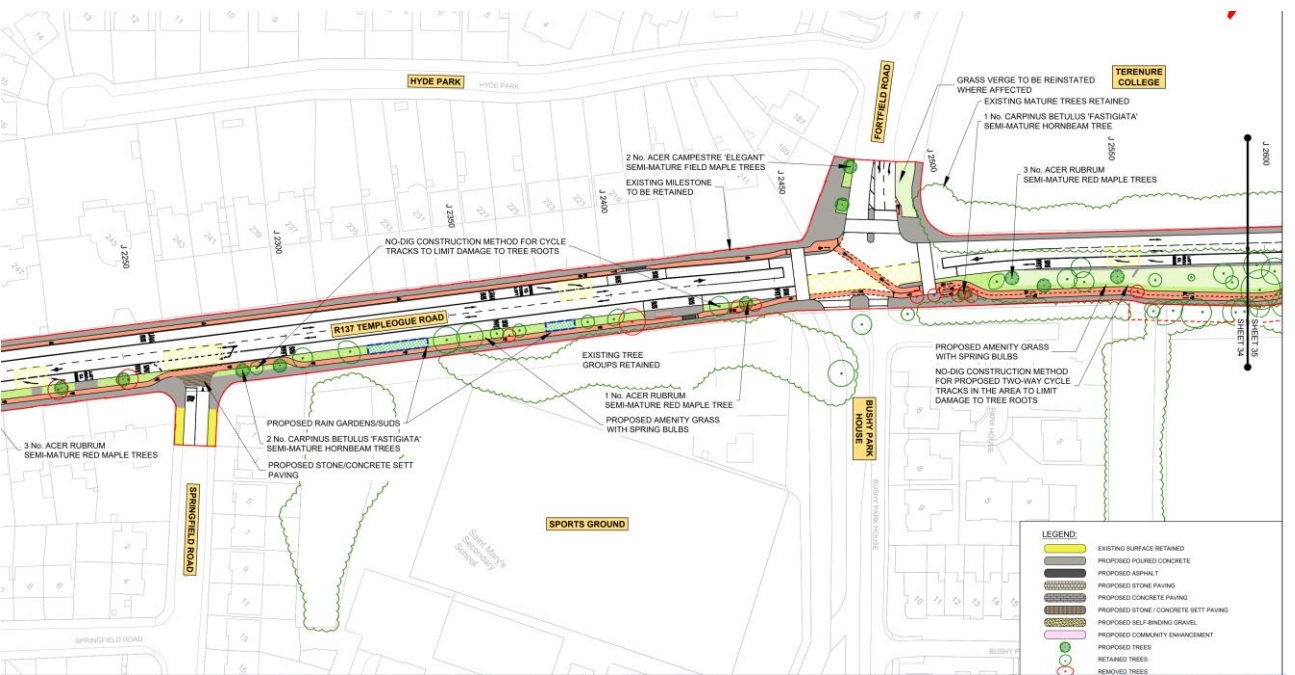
Extract from Landscape General Arrangement Plan Sheet 34 of 37
